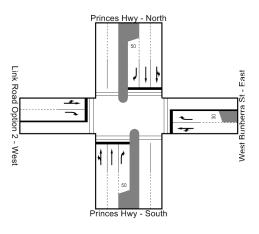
Princes Highway and West Bunberra Street Required Layout
